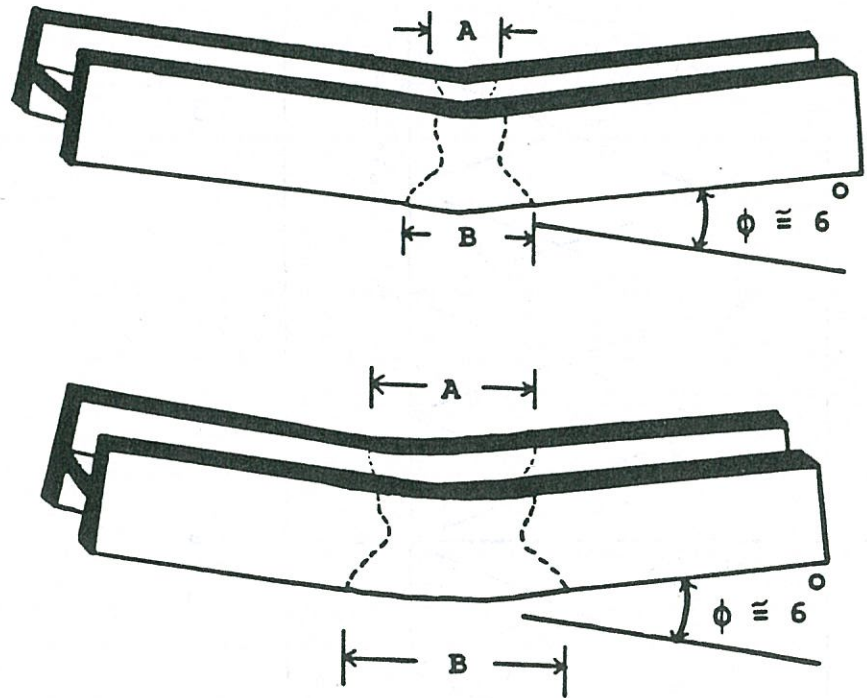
Spreading of yield zone in subsequent bends of damaged wide flange beam specimens.
